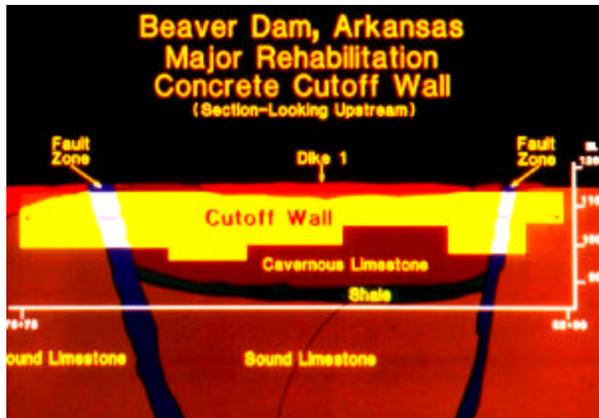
Results from geophysical studies were used to design a concrete cutoff wall at Beaver Dam, Arkansas
